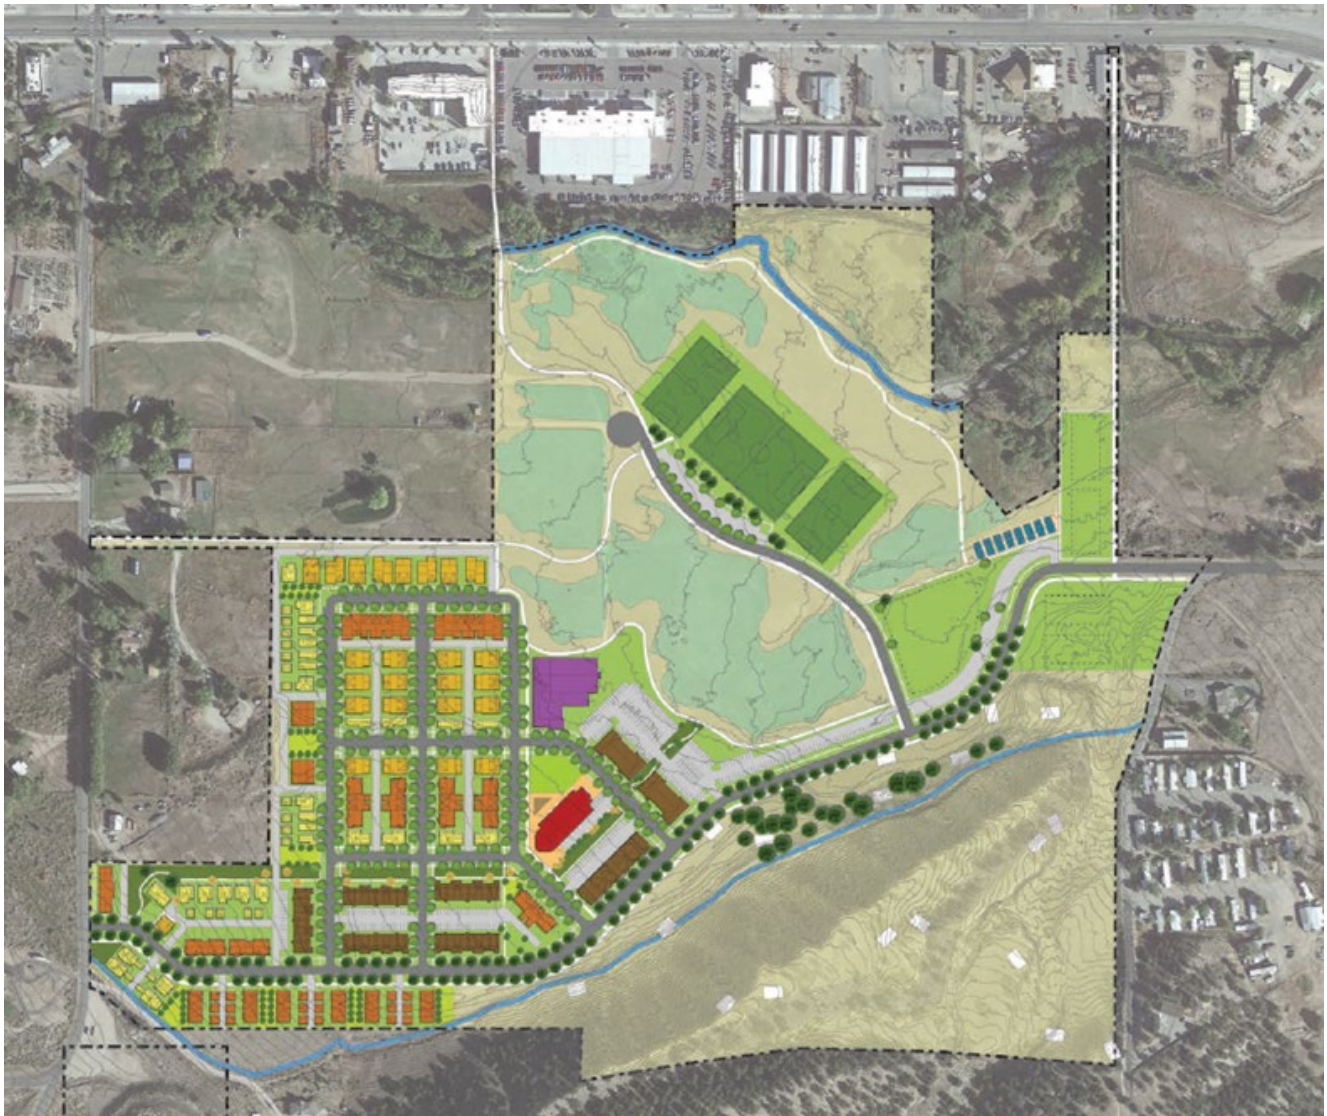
Master Plan Details for South Ark Neighborhood (Alternative Option)
